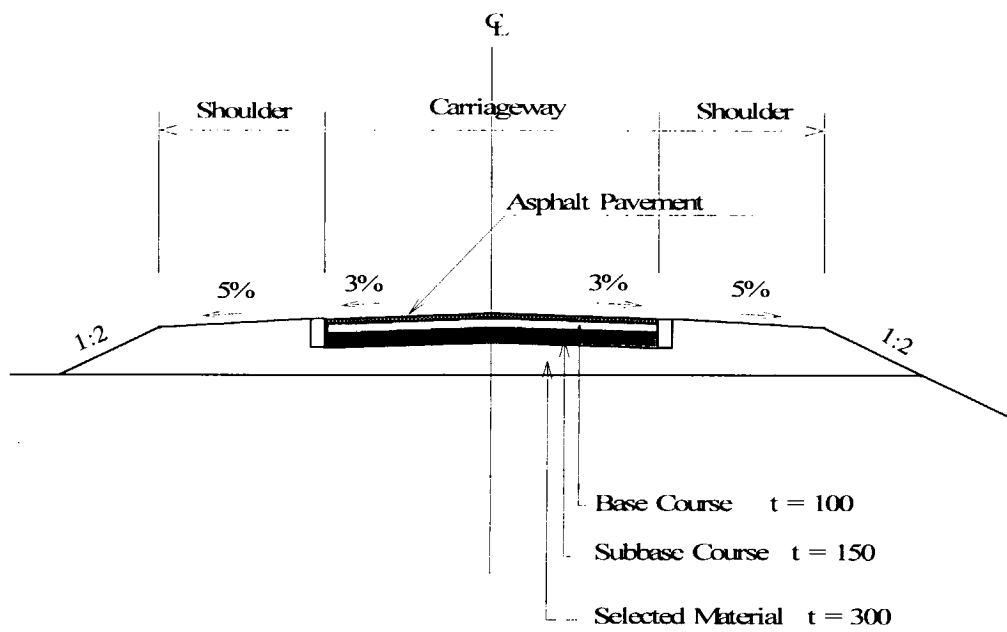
TYPICAL CROSS SECTION OF APPROACH ROAD
